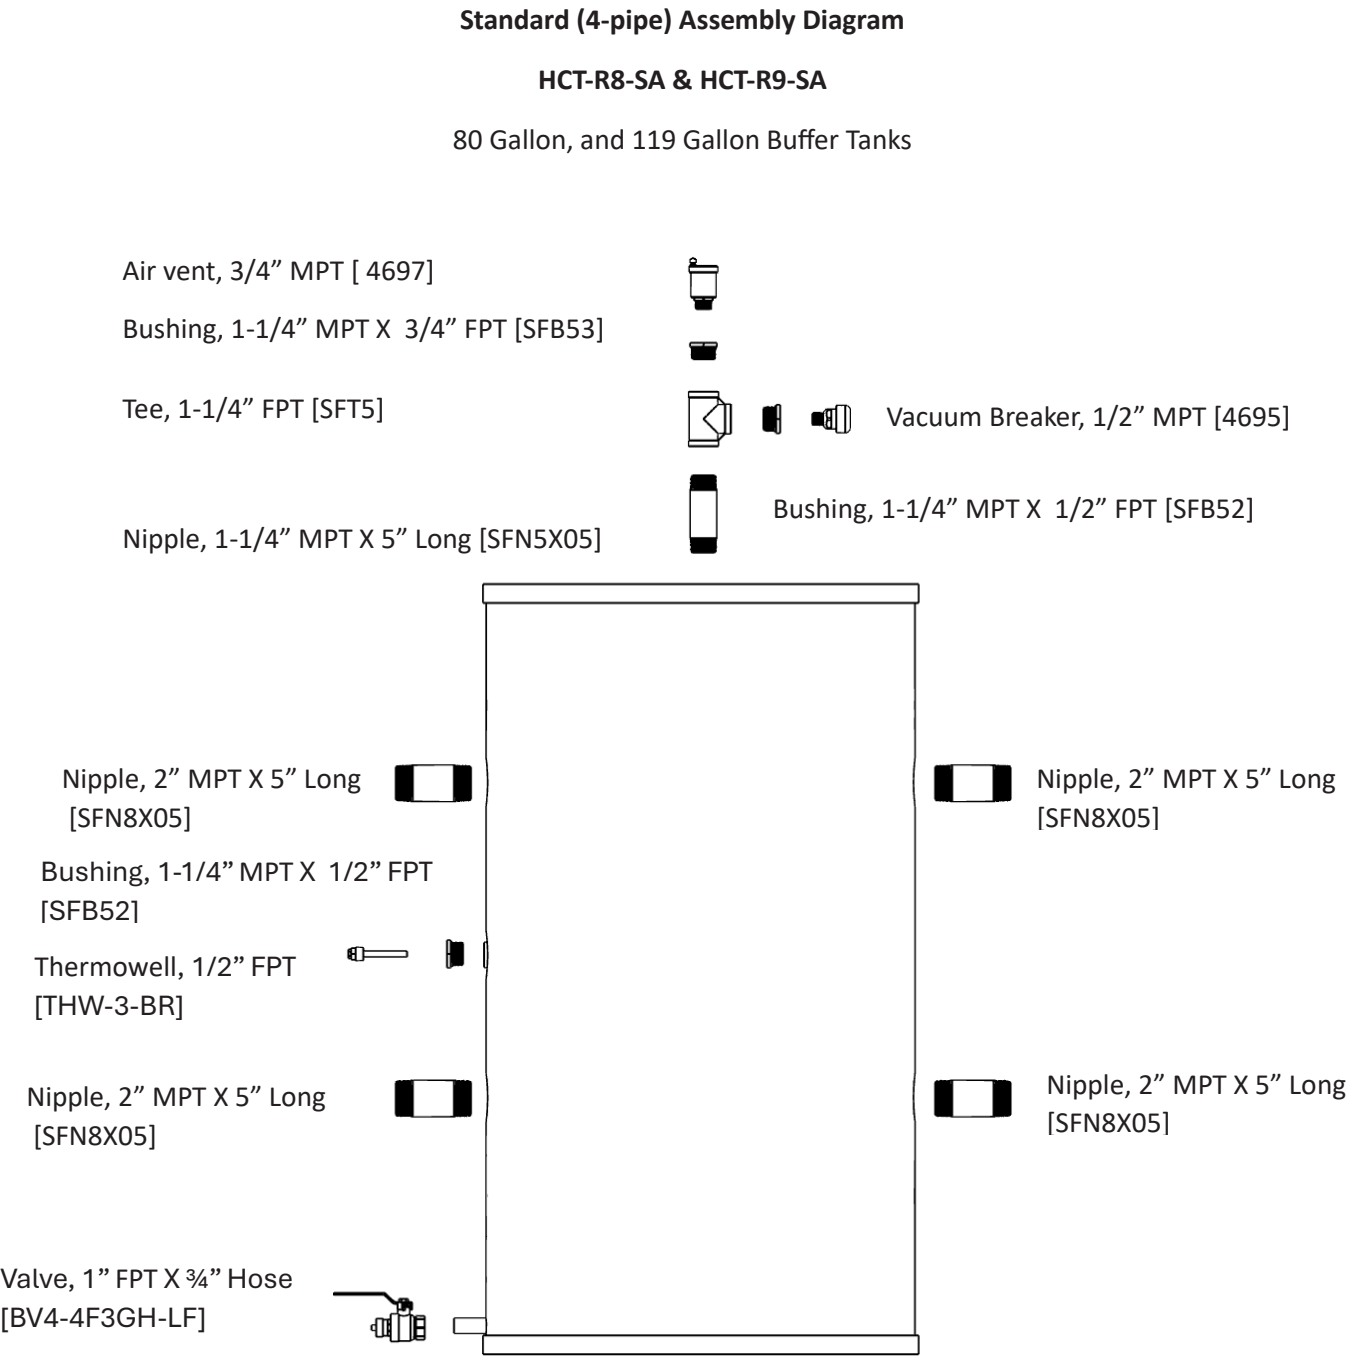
E. HCT-R_-SA Standard with Air Vent (4-Pipe) Assembly Buffer tank components.
